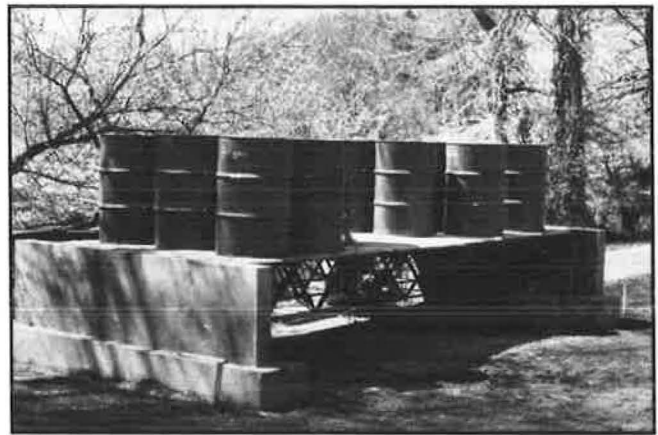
Pedestrian bridge in place over the discharge channel of an irrigation pond at Pen Park.
